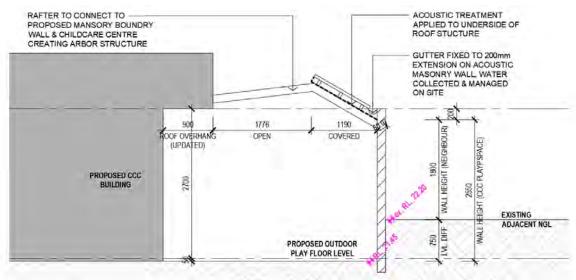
Cross section of the proposed shade structure/acoustic barrier along the northern boundary
